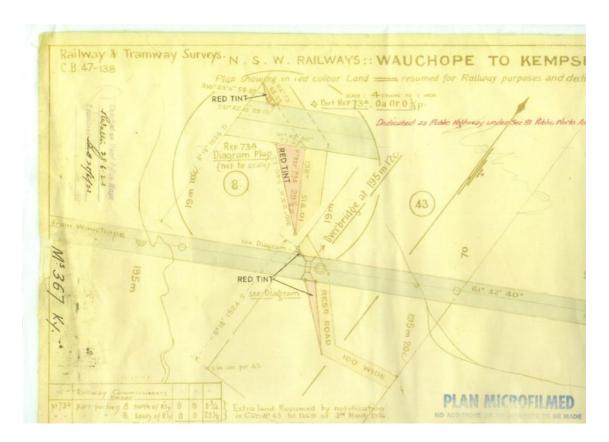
J.S.R 1923. N.S.W Railways: Wauchope to Kempsey Plan showing in red colour land resumed for Railway purposes and dedicated as a Public Highway (Source: NSW Department of Lands. Plan 367.3065)
